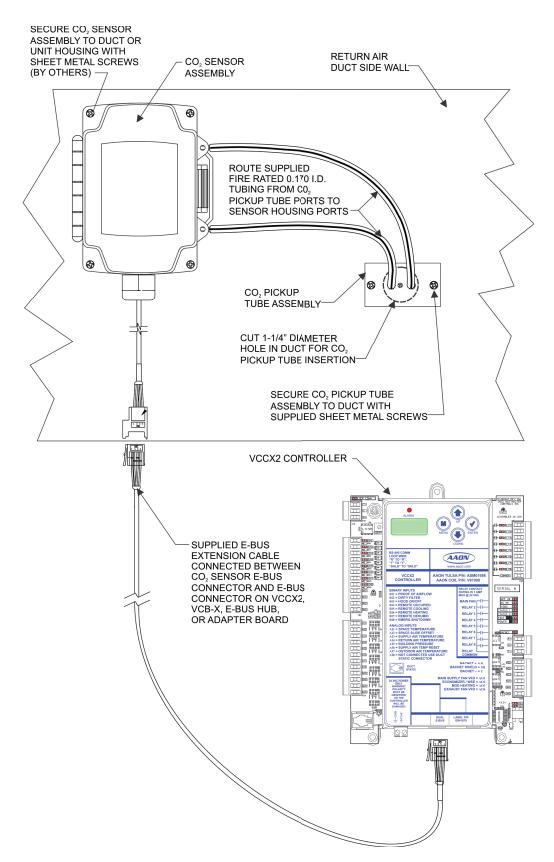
Mounting and Cable Installation for Duct Mounted E-BUS CO, Sensor
